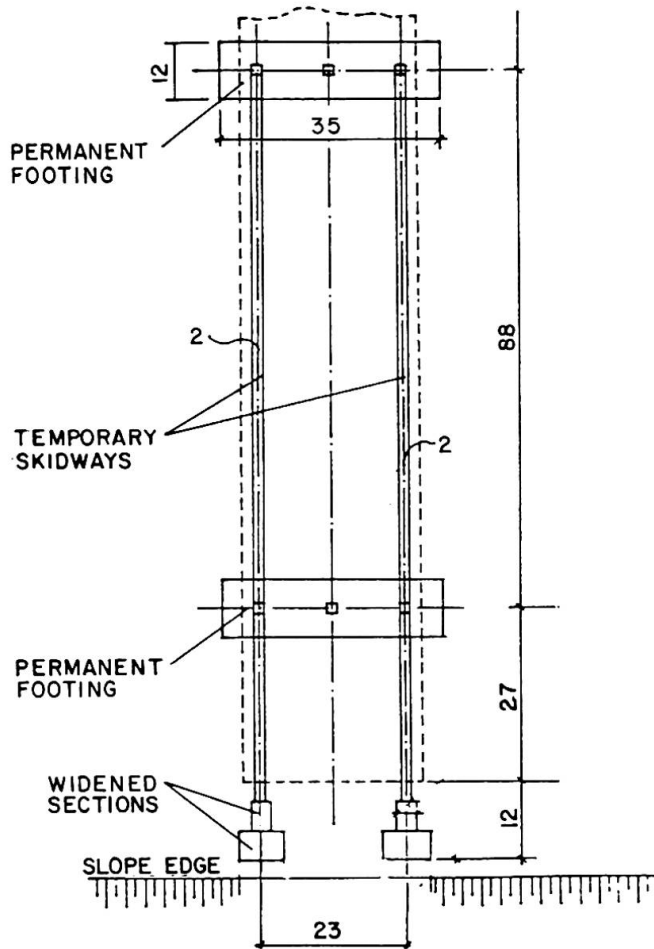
LAYOUT OF SKIDWAYS AND FOOTINGS FOR DRILLING I-DECK
